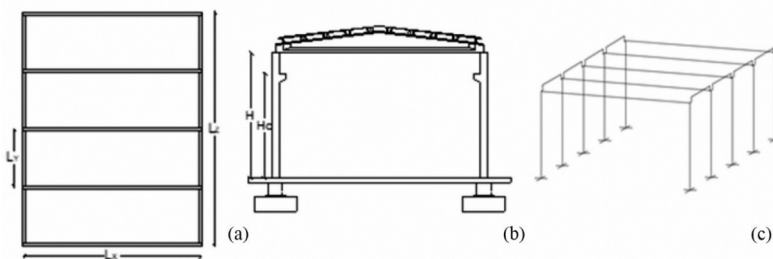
Prototype PRC buildings in plan view (a), transversal frame (b), and numerical model (c).
